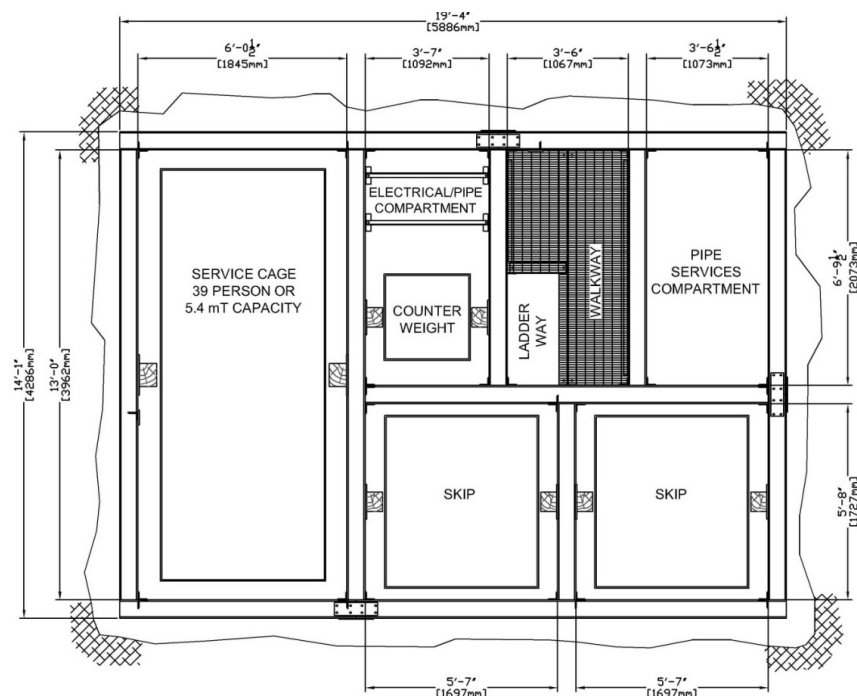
Ross Shaft, typical shaft set. [SRK, Courtesy Sanford Laboratory]
